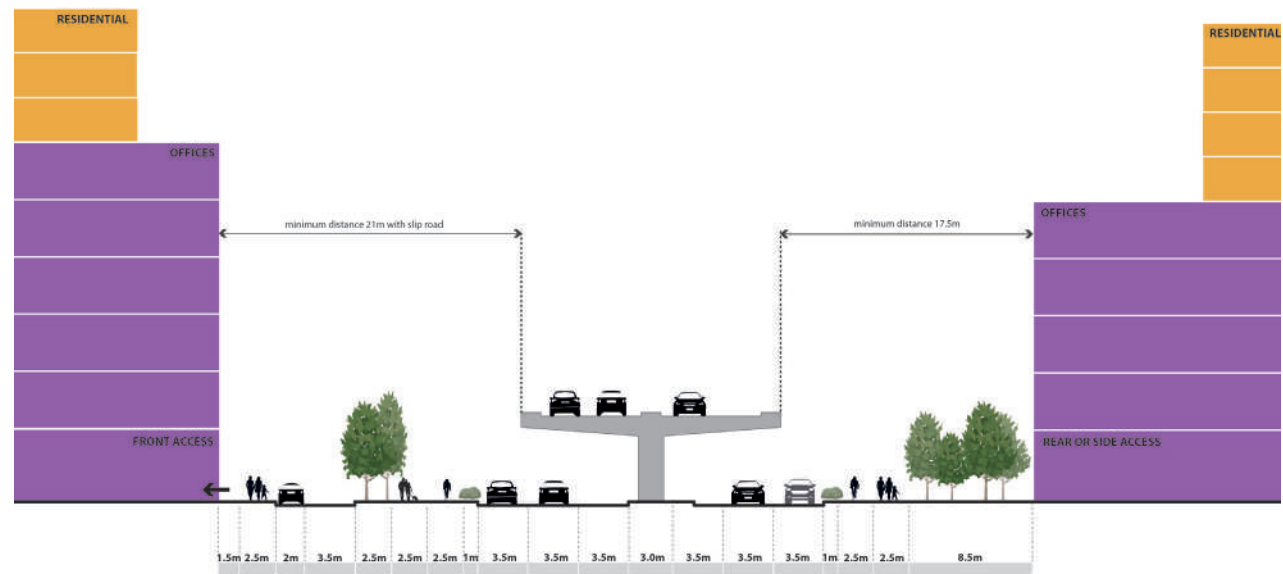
Great West Road (Central and East Areas) Indicative Section
